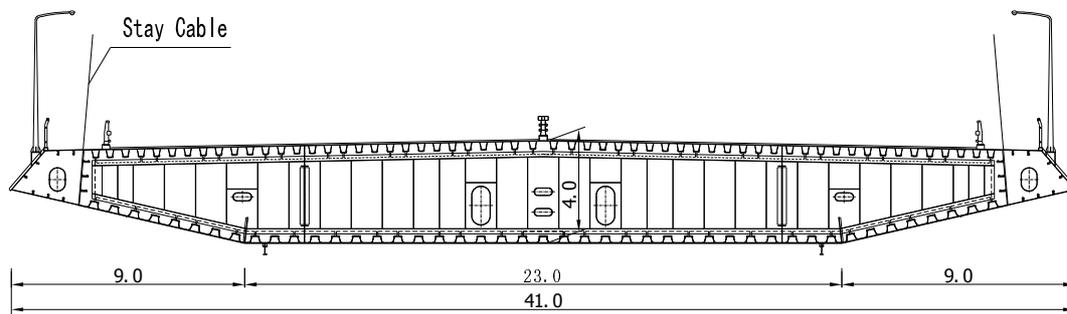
CROSS SECTION OF THE GIRDER (UNIT: M)
